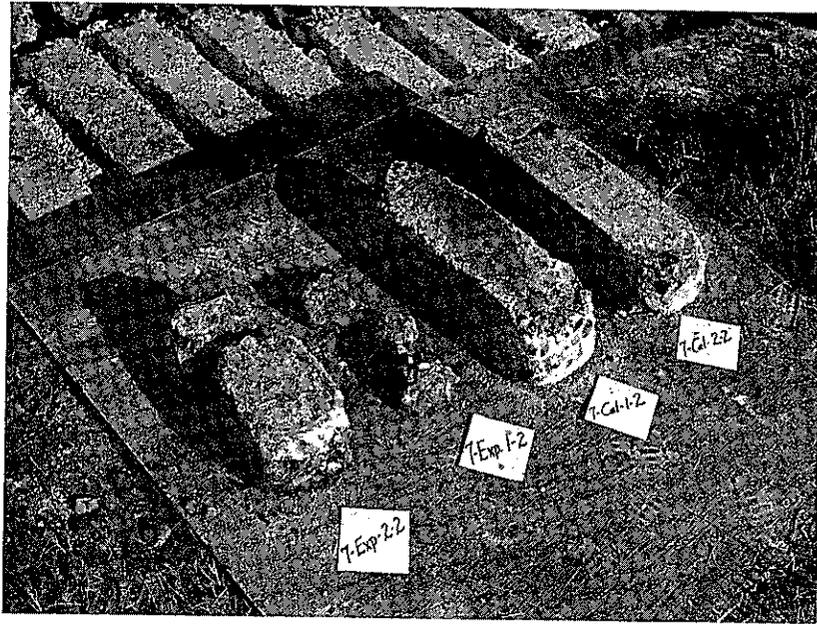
7-sack concrete after 36 months of sulfate exposure. Shrinkage compensated cement beams on left and Type II cement beams on right. Specimen 7-Exp-1-2 removed from test.
